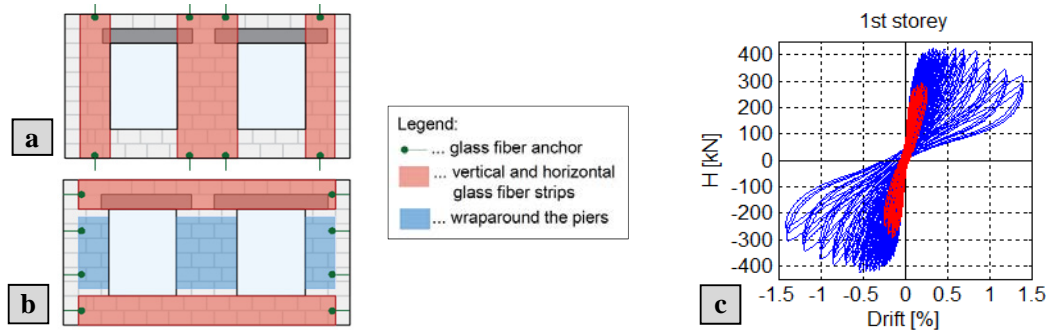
Girder layout layer 1 (a), girder layout layer 2 (b), and hysteretic response of the 1st floor (c).
